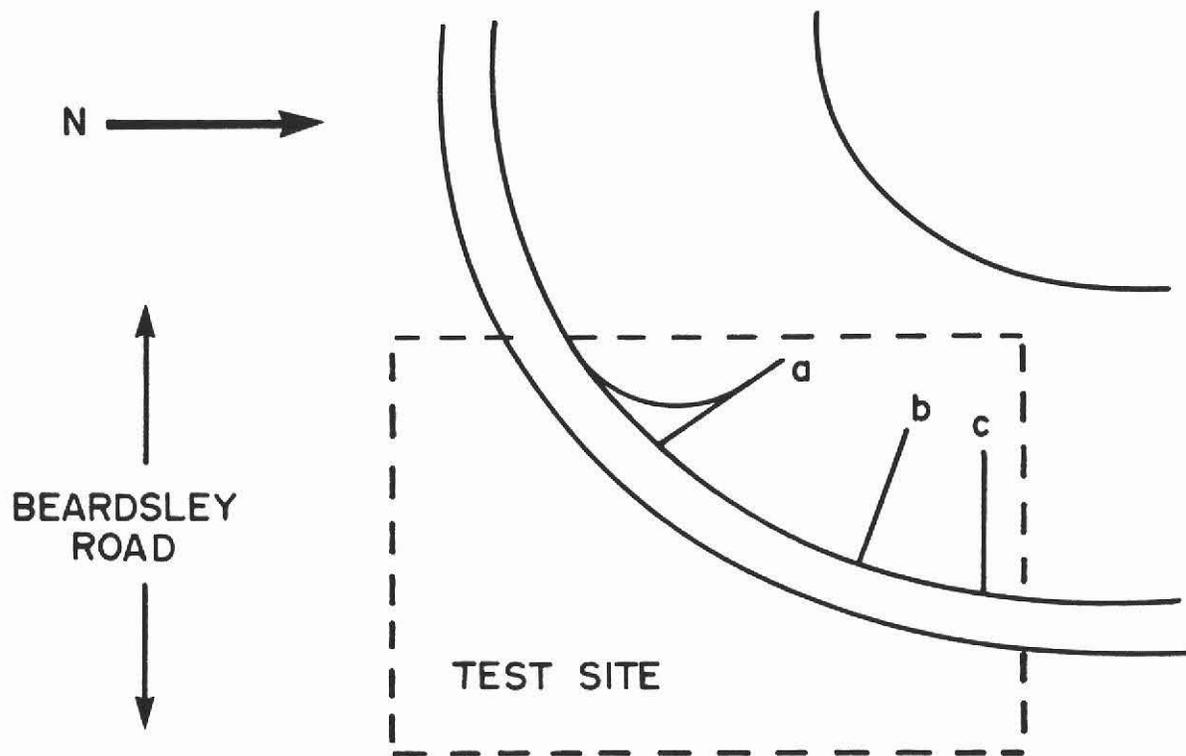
MARKINGS ON THORITE TEST SITE
